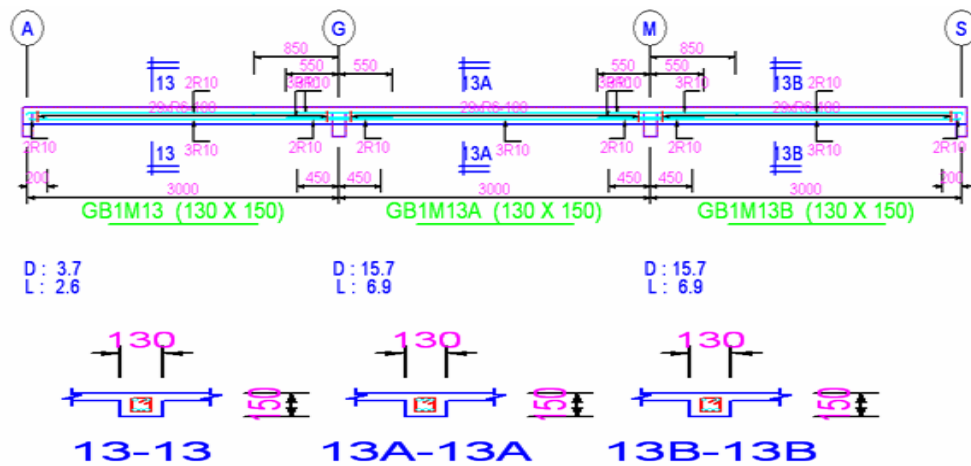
Section and Distribution of Steel bars for Maximum Moment in Beam₁₃ (joist)
